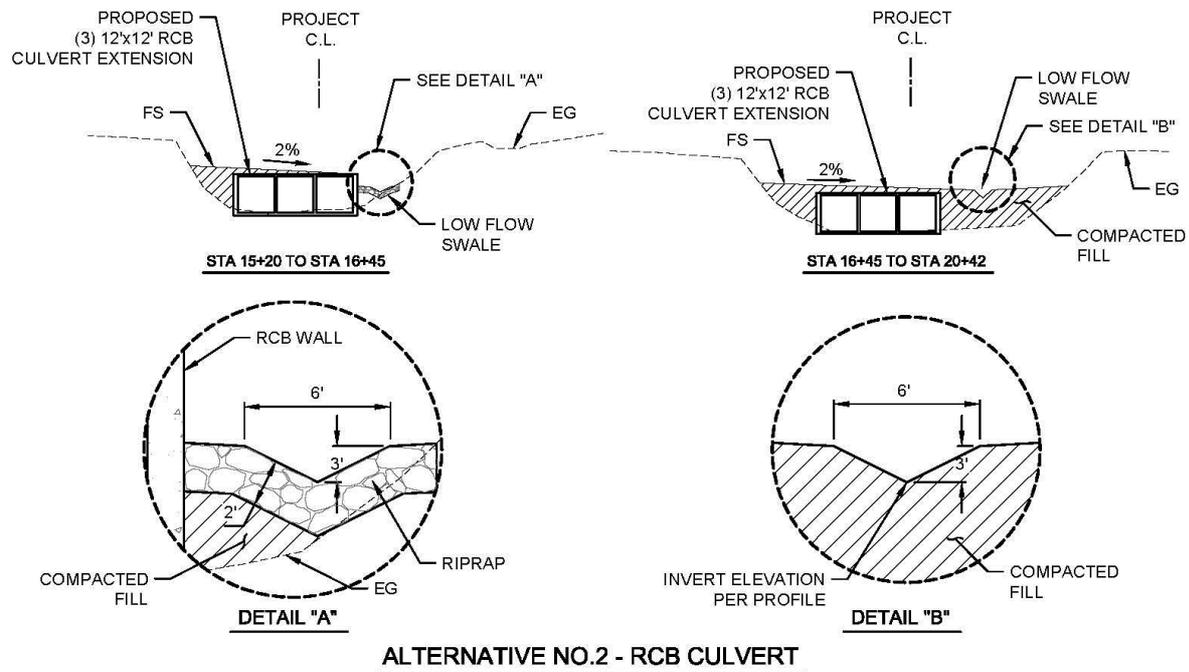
Typical Section of RCB Culvert Extension (Alternative 2)
